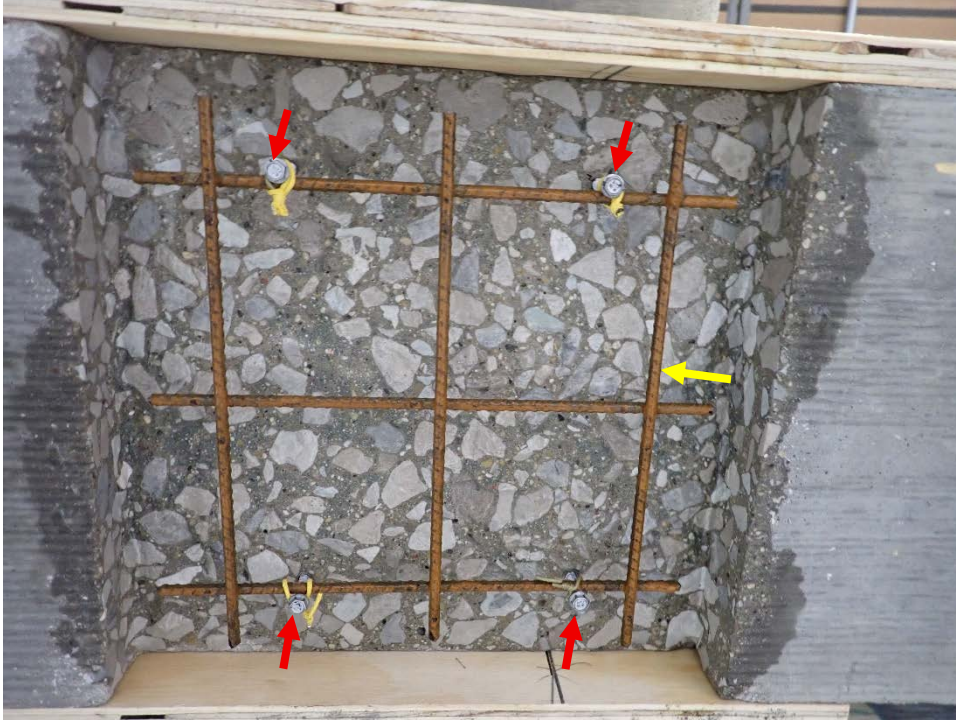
Supplemental anchors (red arrows) and welded wire reinforcement (yellow arrow) for concrete repair
